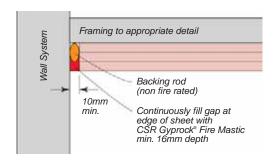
Suitable for 2 and 3 layer plasterboard ceiling systems.
